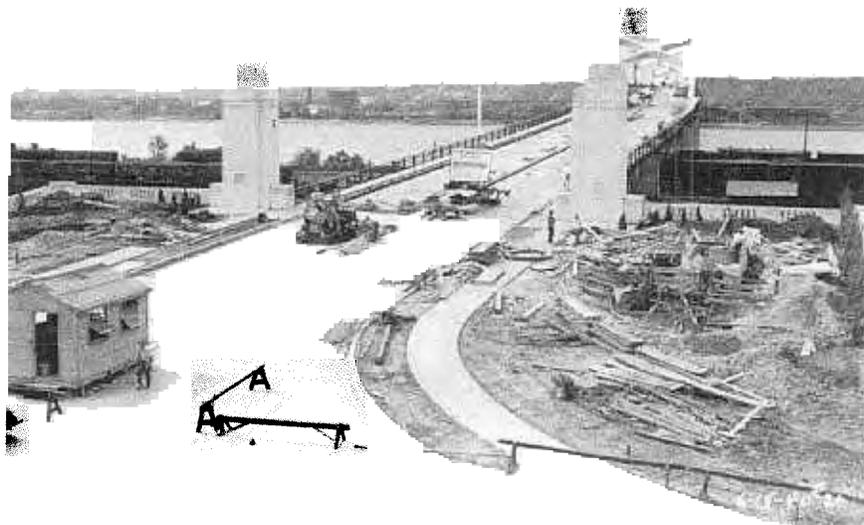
Rock Island Entrance to Bridge Shortly Before Grand Opening
